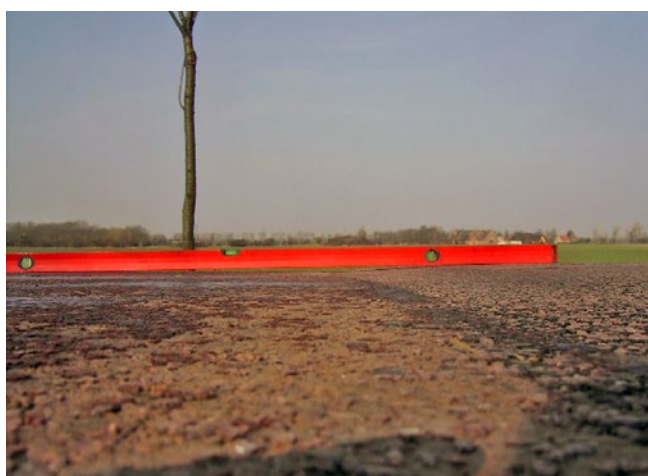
Improperly executed transverse joint due to insufficient cut-back of the old pavement [11]
